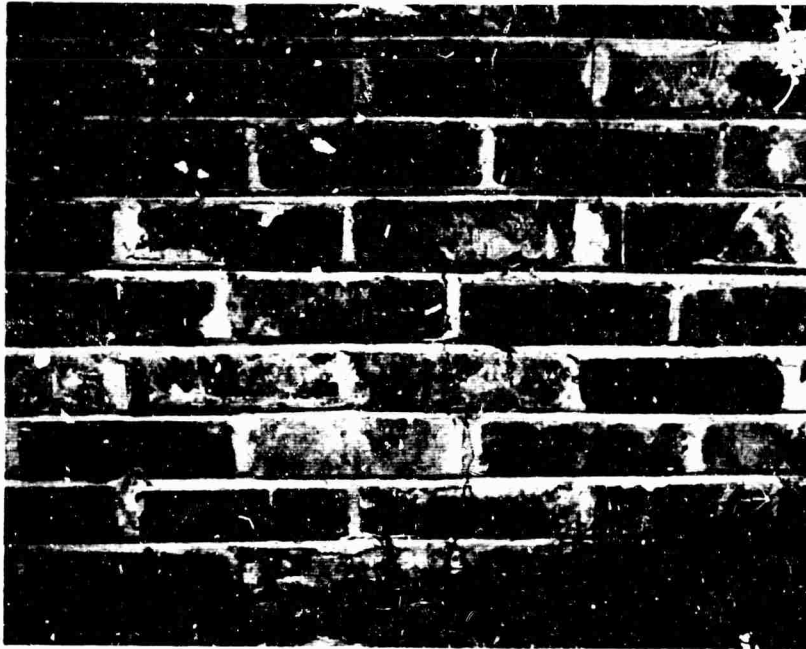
Pre-Shot Cracks, H&N No. 190
